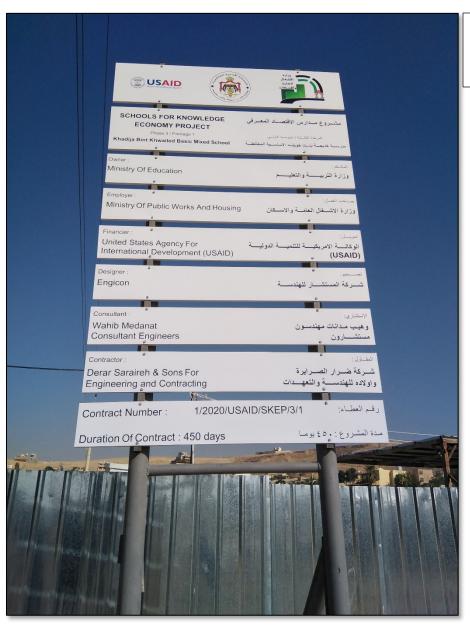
Project ID Sign Board on site. Photo credit: Odai Tawalbeh, 1/25/2021
